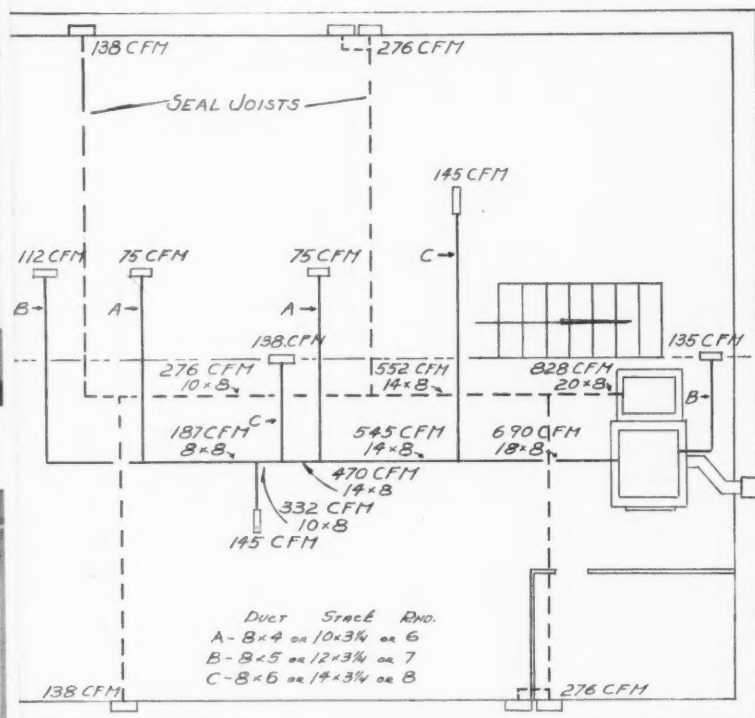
Basement plan showing layout of piping for fan circulation; cfm's required in branches and main sections and pipe sizes as selected from Tables 3 and 4.
